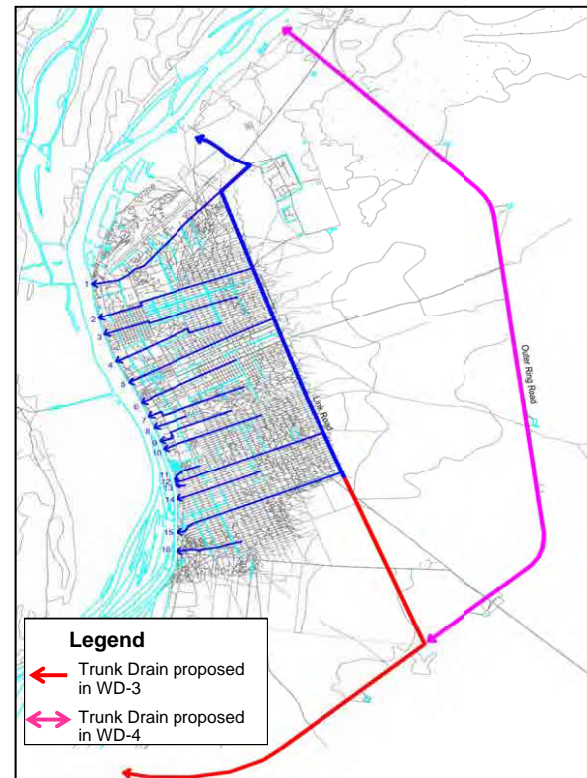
Construction of Trunk Drains 2 (WD-4)
